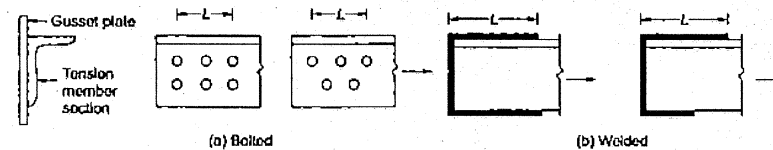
Explanation of 'L' for welded and bolted connection
